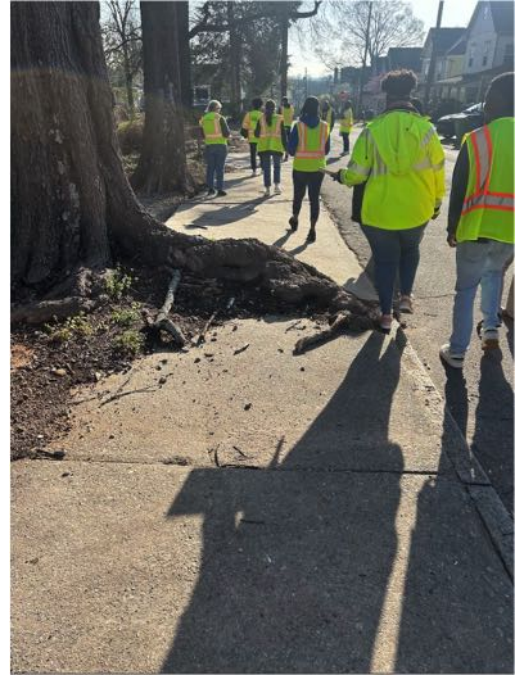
OVERGROWN ROOTS BLOCKING SIDEWALK ALONG GLENN STREET
